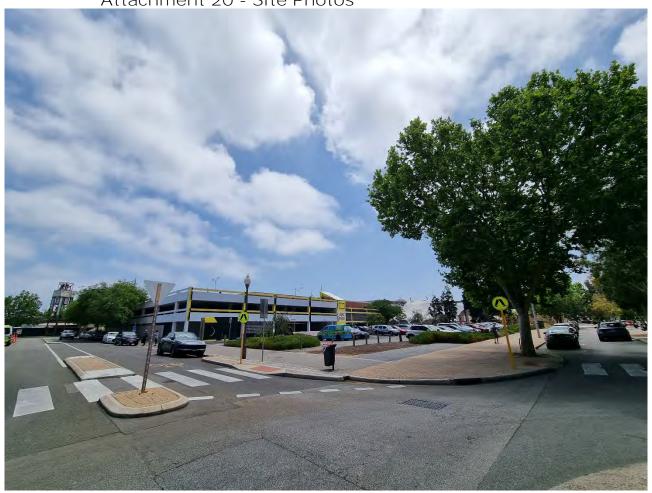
Subject site as viewed from the junction of Point and Adeliade Street – view to south-eastern corner of site
